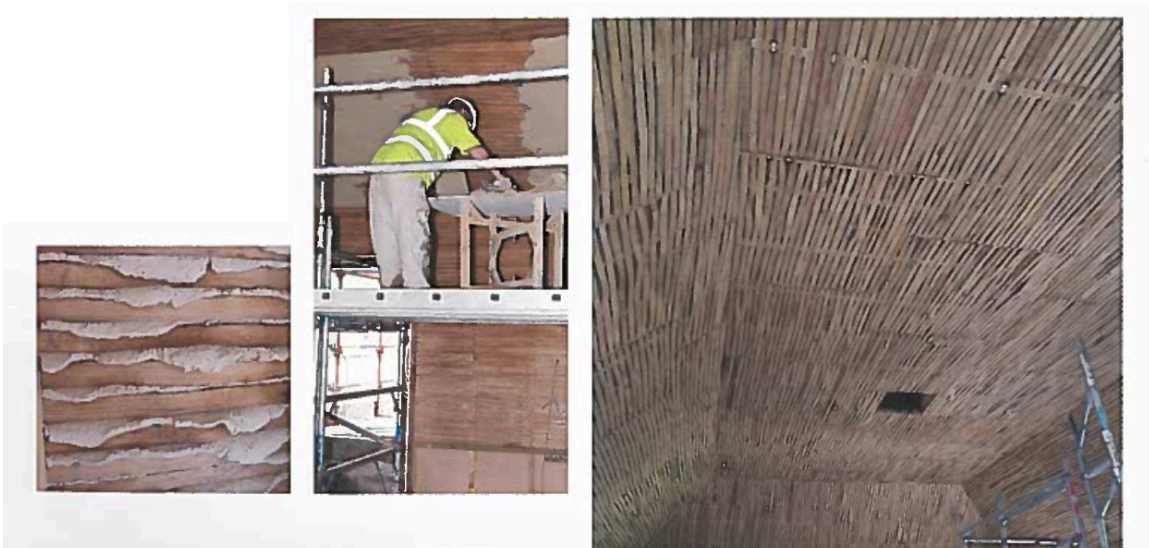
Utilizing Georgian building techniques, traditional lath-and-plaster construction used over 5,000 stripes of oak and insulated with sheep's wool for the ceiling in the Professor's Room (Forsyth 2016a: 21).
